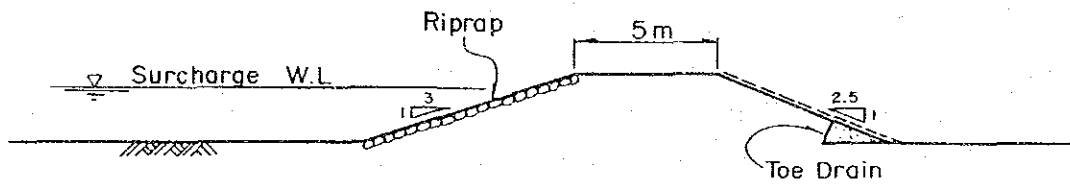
Typical Cross Sections of River Improvement Works (1/2)
